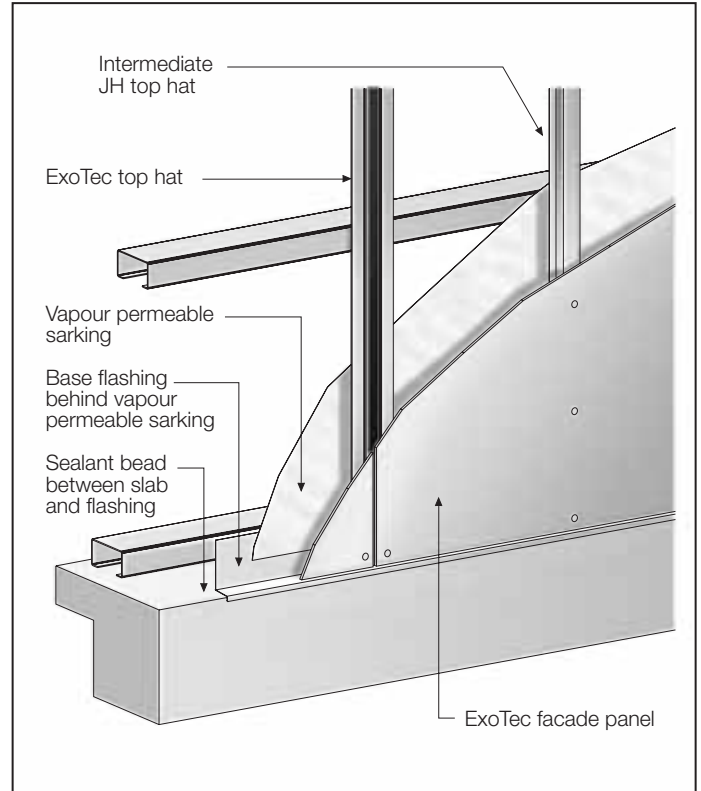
WALL BASE CUTAWAY TYPICAL DETAIL 2
